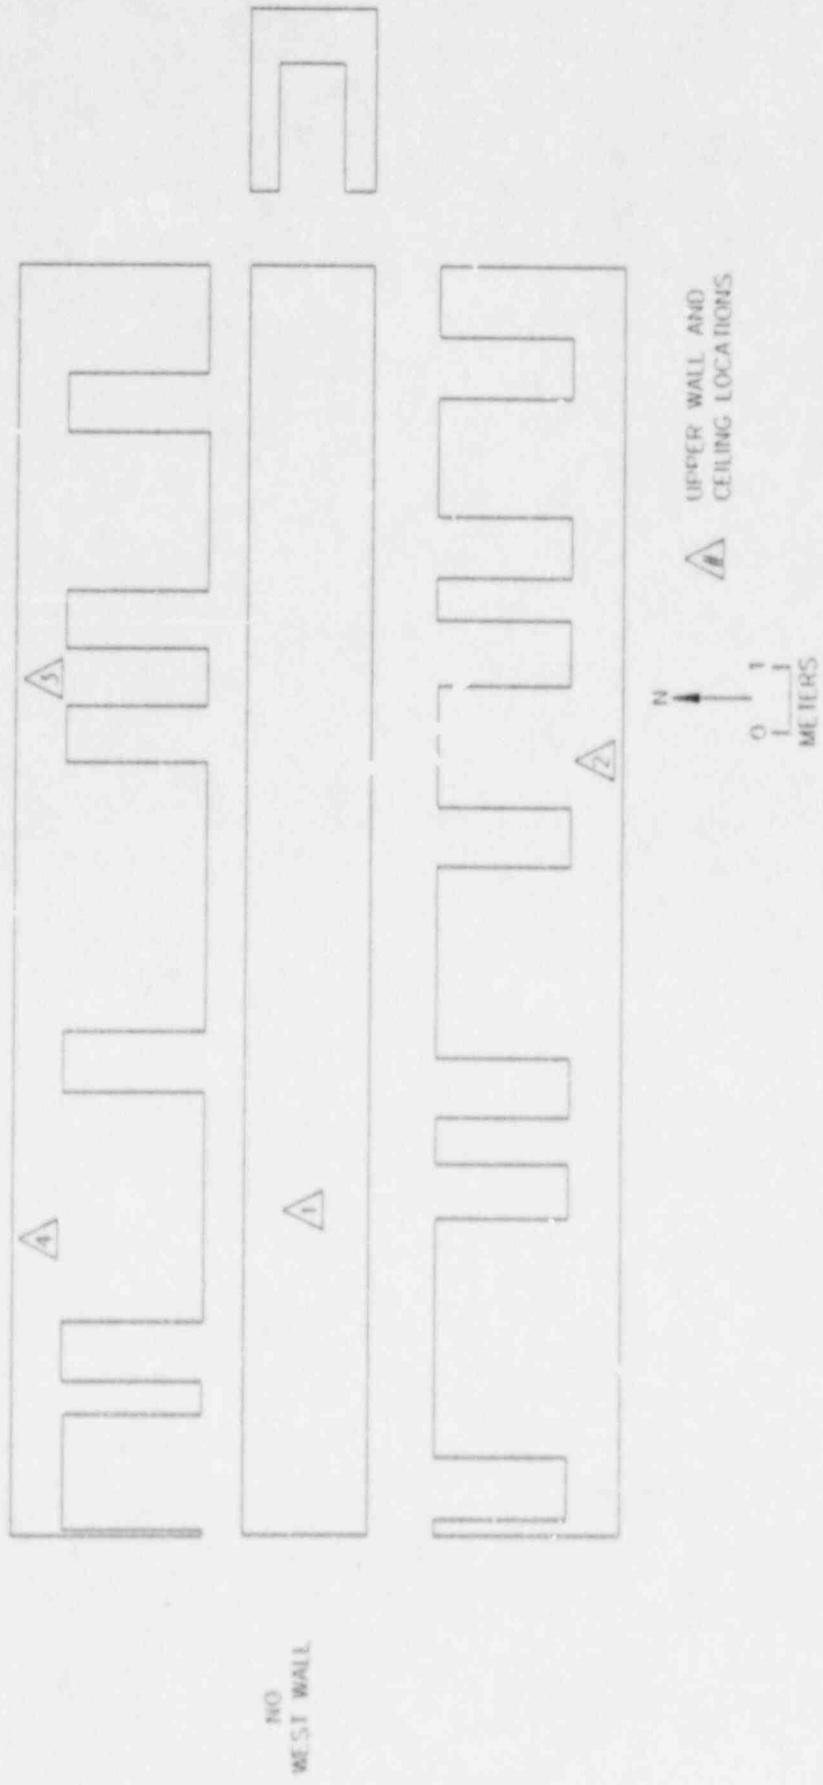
Hallway (Area 56) Showing Locations of Upper Wall and Ceiling Single-point Measurements
